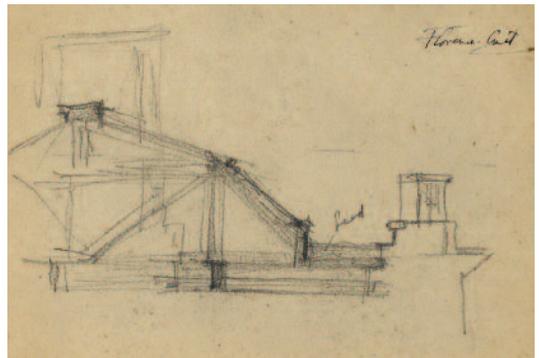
Sir Albert Richardson, sketch proposal for rebuilding the roof of Florence Court. *Simon Houfe*.
